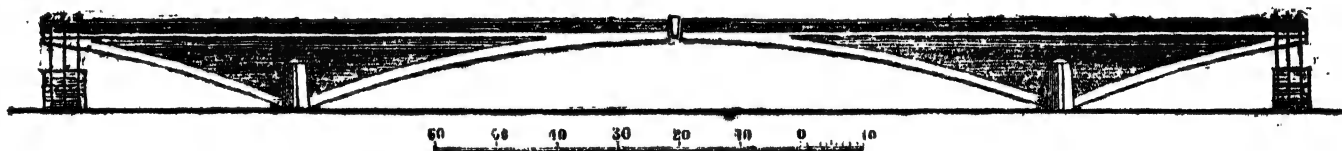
ELEVATION OF A BRIDGE, CONSTRUCTED ON THE PRINCIPLES OF THE EXPERIMENTAL ARCH.
